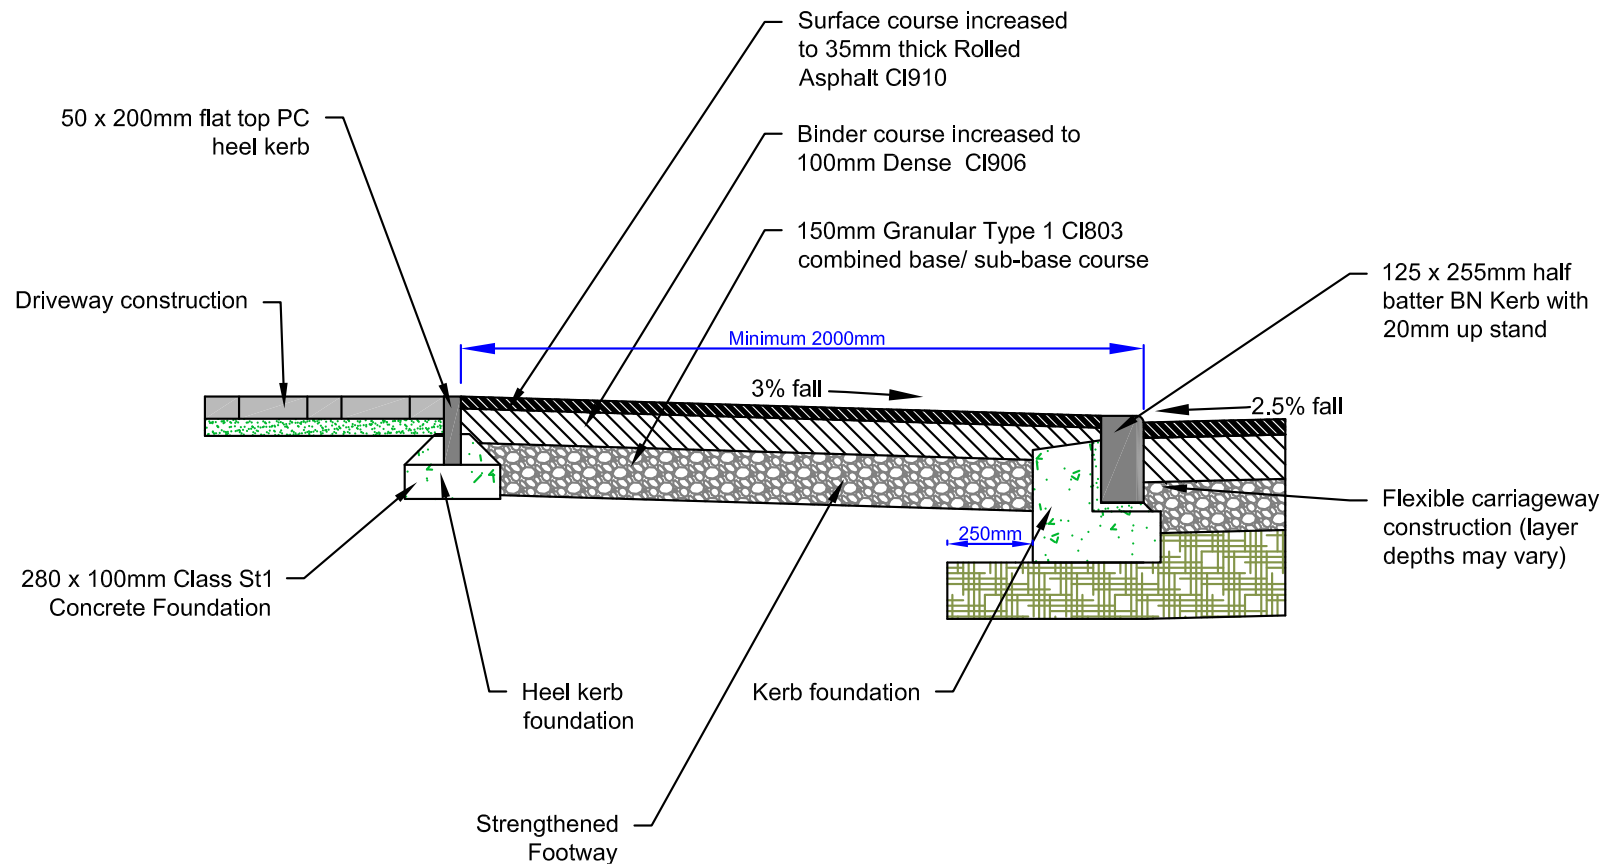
Typical Footway/ Verge Crossover (dropped kerb application)
